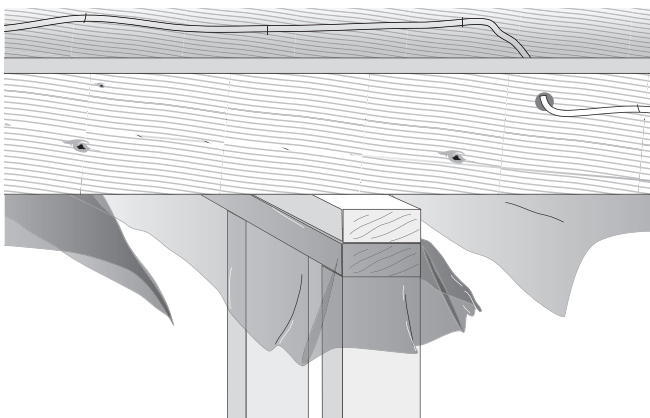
Putting a polyethelene tab between the wall top plates to be sealed to the ceiling vapor retarder later
